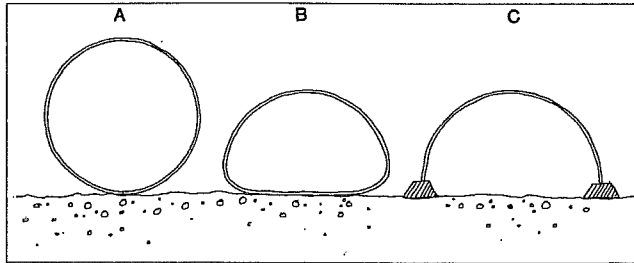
Types of metal culverts used on western forest and rangeland roads: (A) corrugated-round; (B) corrugated pipe-arch; (C) structural plate-arch with concrete footings.
